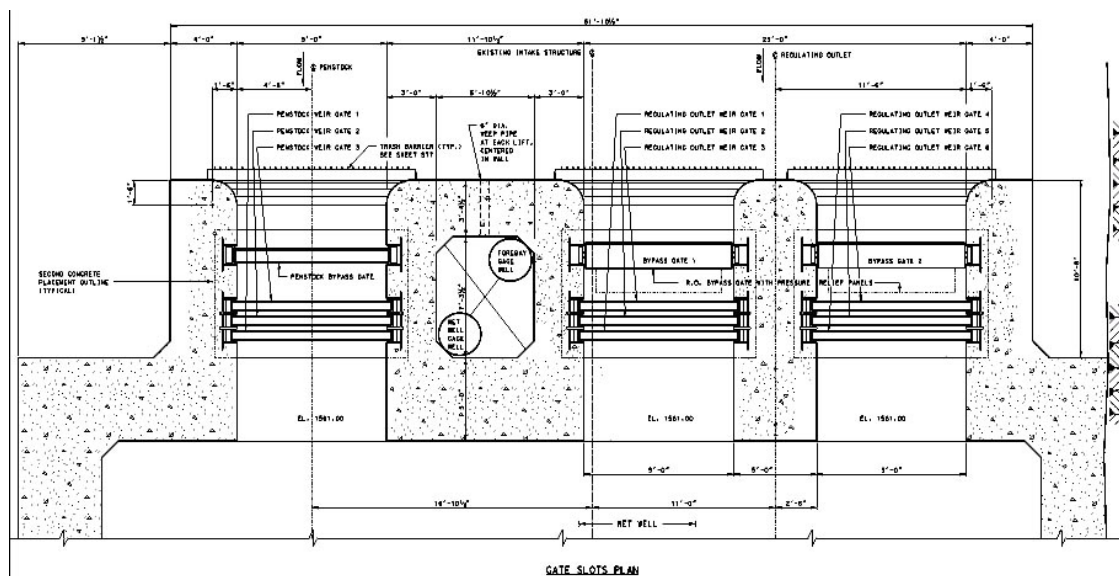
Plan View of Cougar Dam Water Temperature Tower Weirs
